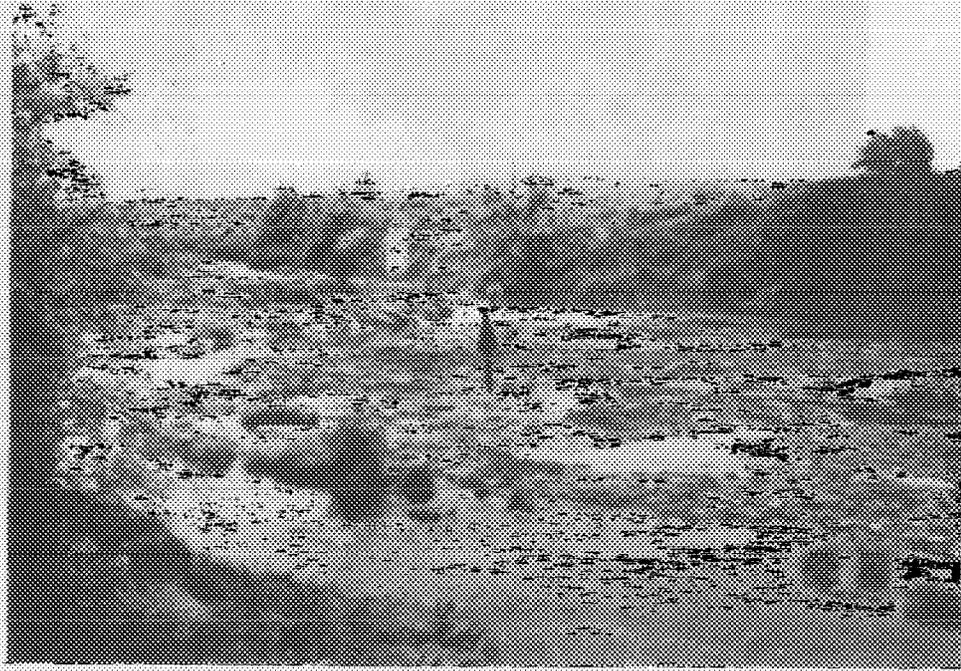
REMOVE 3'x3'x1' ROCK STA. 78+20
